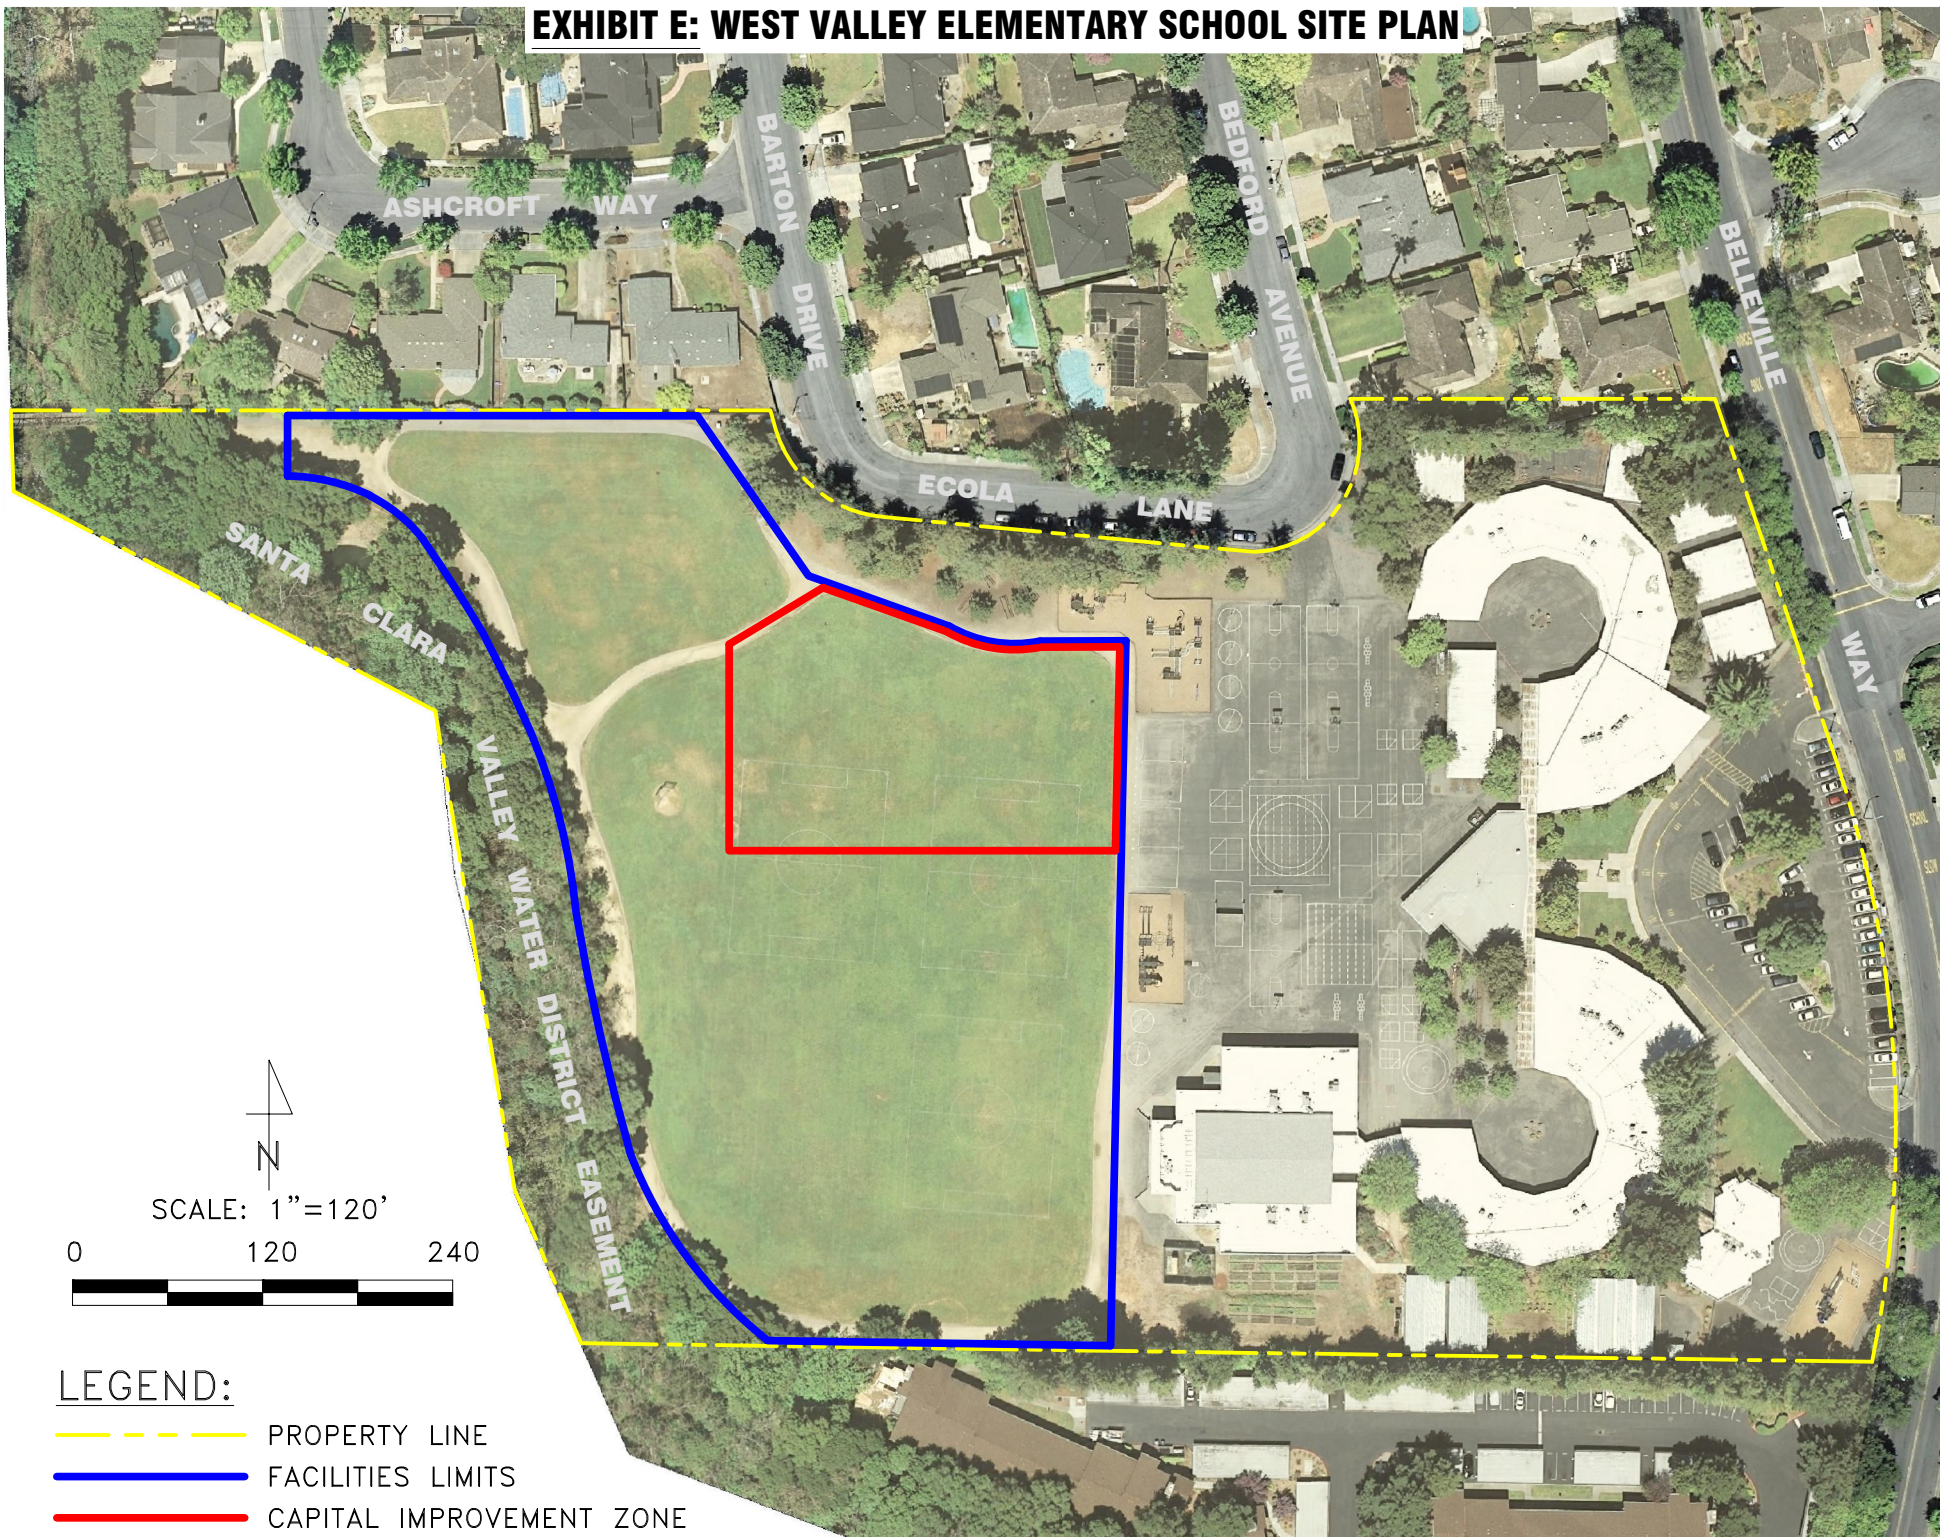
EXHIBIT E: WEST VALLEY ELEMENTARY SCHOOL SITE PLAN
